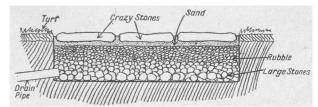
Section of path showing how the Crazy Paving. flags are set in sand on a foundation of rubble and large stones to ensure proper drainage.
